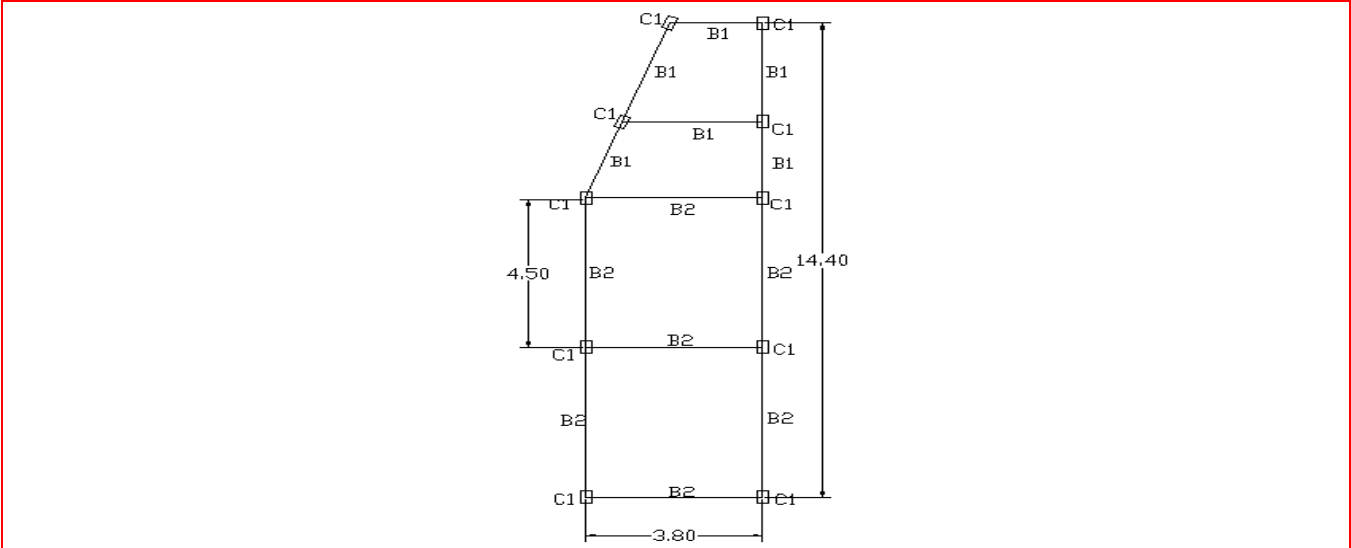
The plan of the four-storey RC building (Model-2) (units in m).
